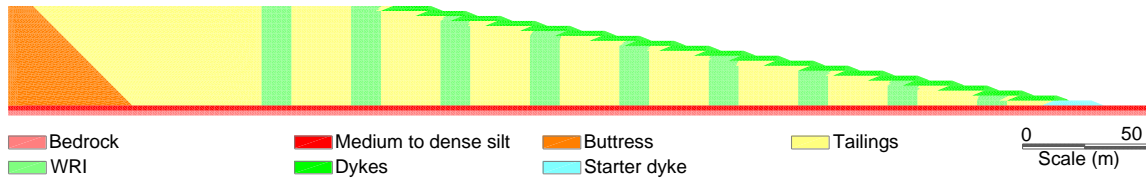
A typical model cross section of the tailings impoundment reinforced by WRI, having widths, W , of 12 m and a spacing, S , of 36 m
